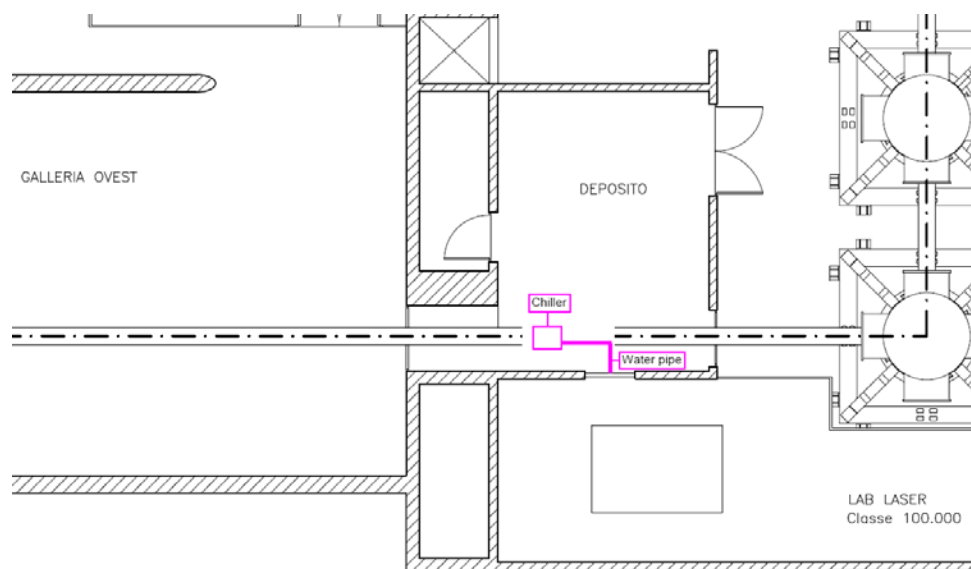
Laser Lab and Deposito Room as they are today. The Laser Chiller is below the Mode Cleaner tube
